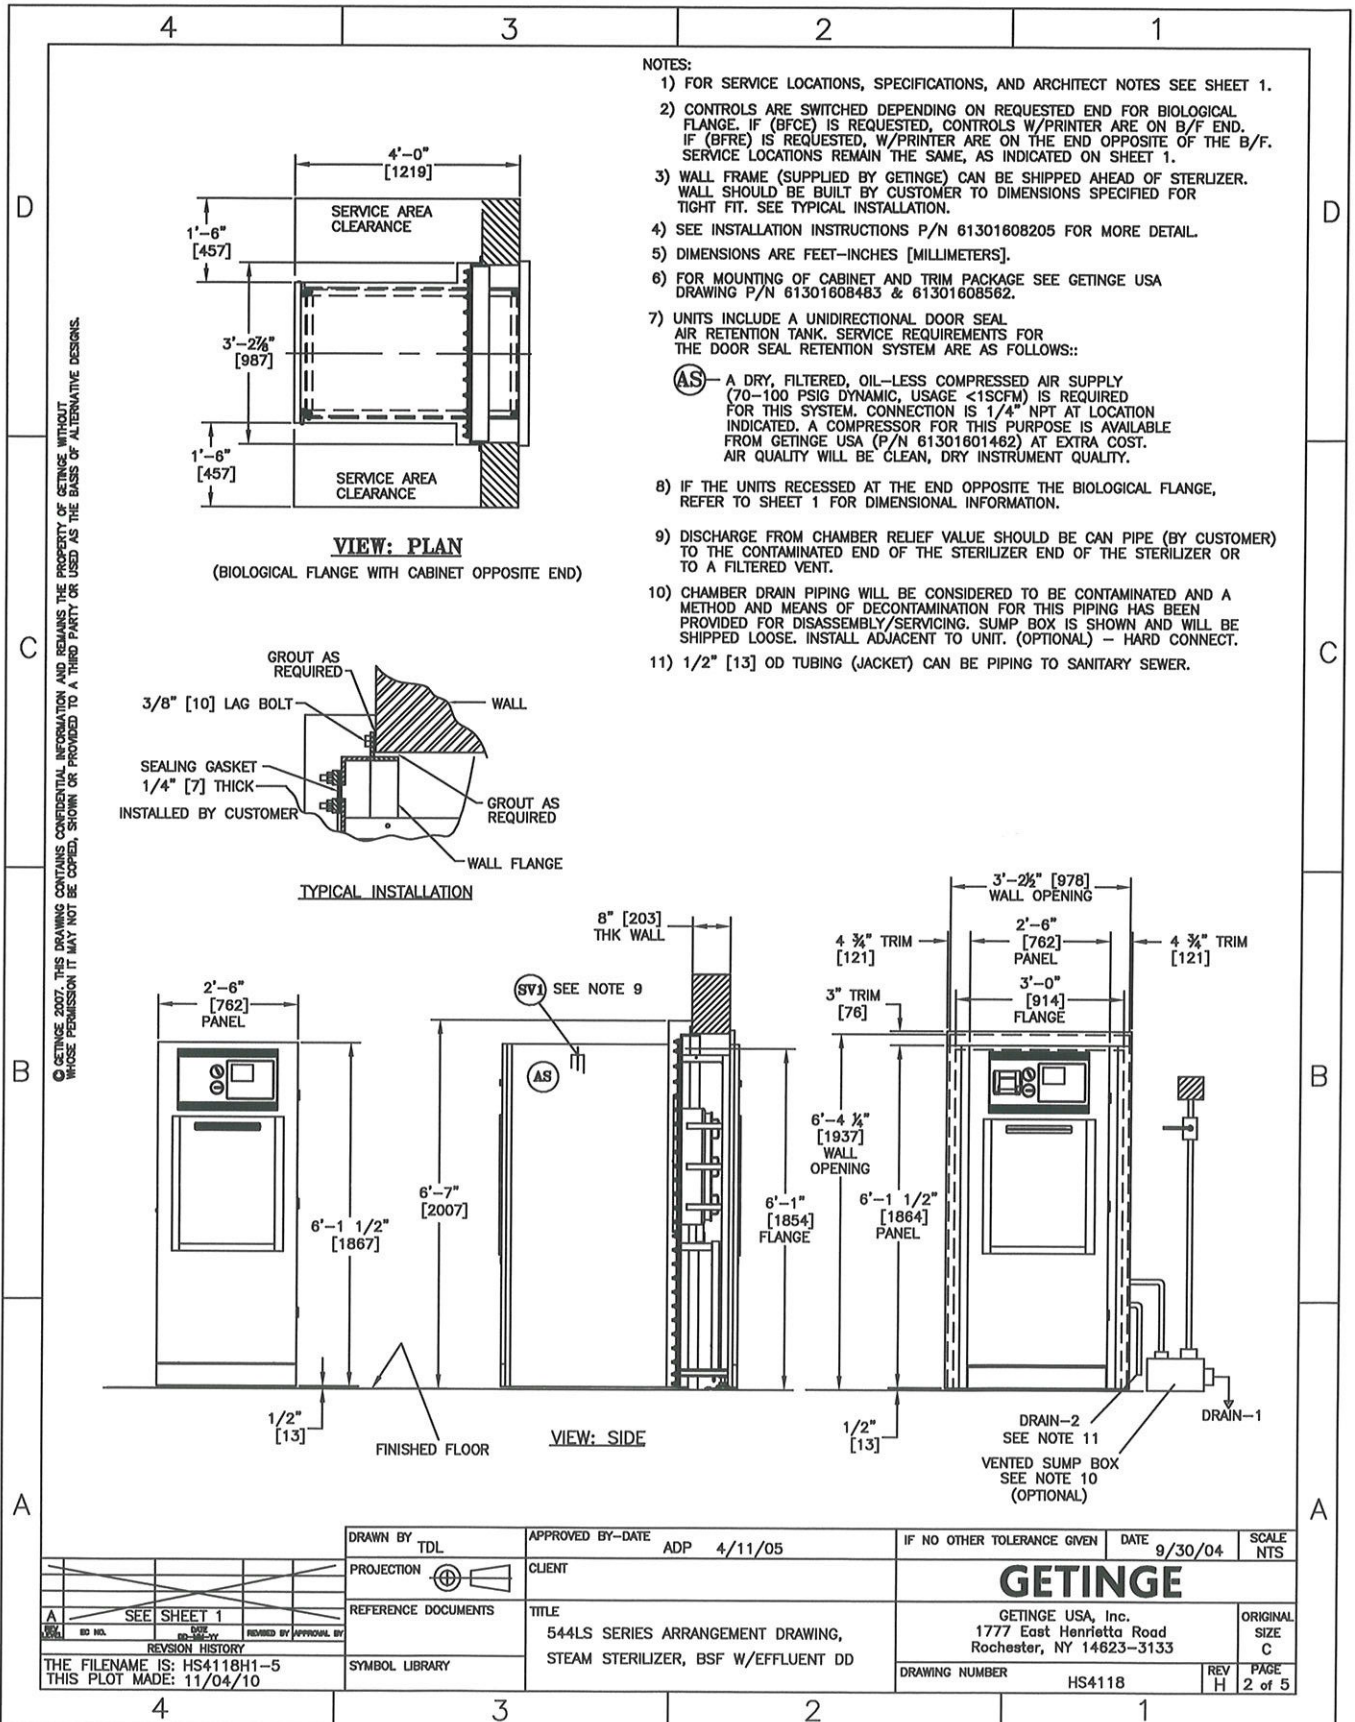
, SHEET 1. 544LS STEAM STERILIZER, DOUBLE DOORS
